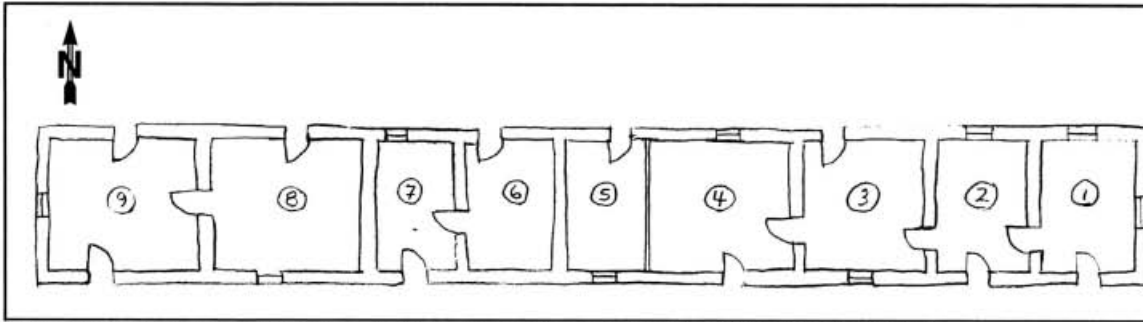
Plan of the De la Osa Adobe showing room numbers and building orientation.
